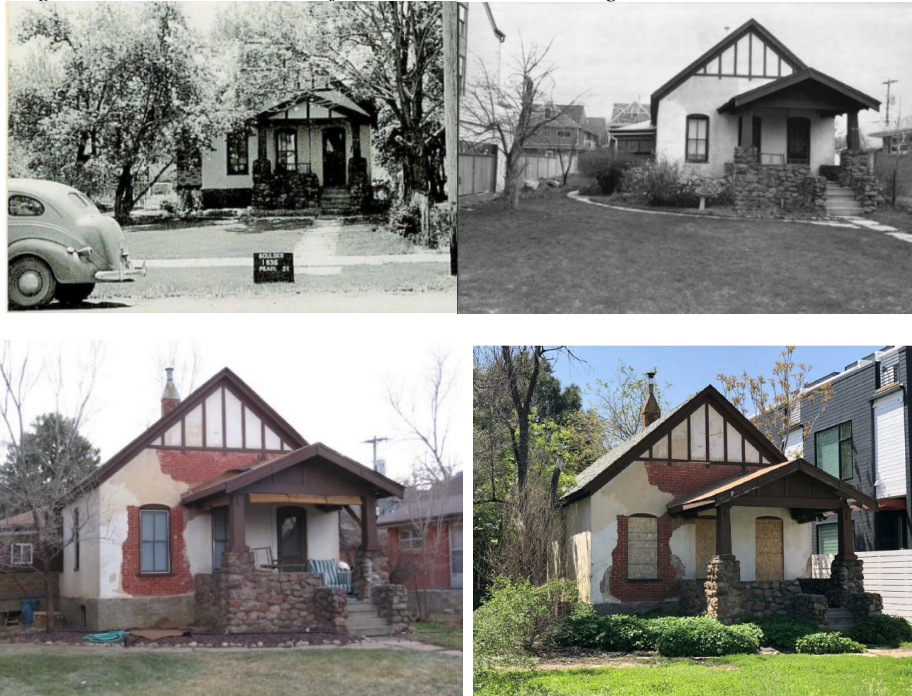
Top left: façade of 1836 Pearl St. c. 1934.<sup>1</sup> Top right: 1988 Survey image of façade.<sup>2</sup> Lower left: 1836 Pearl St. c. 2016 showing house in original location on site, masonry behind applied stucco, and front porch. Lower right: 2018 image showing 1836 Pearl St. in original location before relocation on site.
